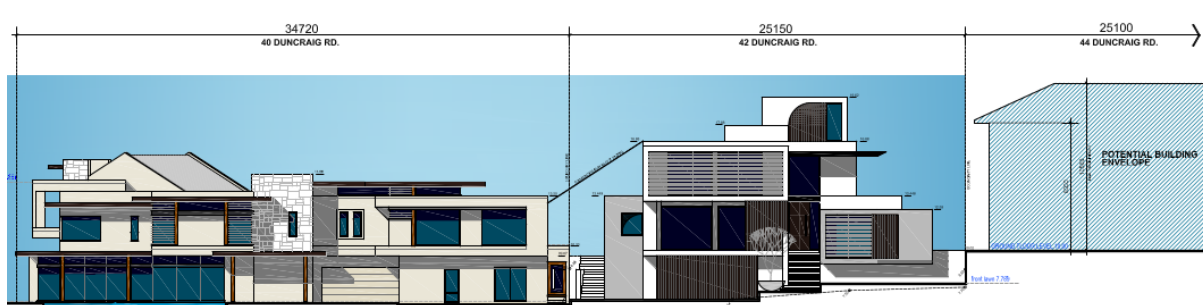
Duncraig Road streetscape with permitted building heights on the adjoining vacant site at 44 Duncraig Road
